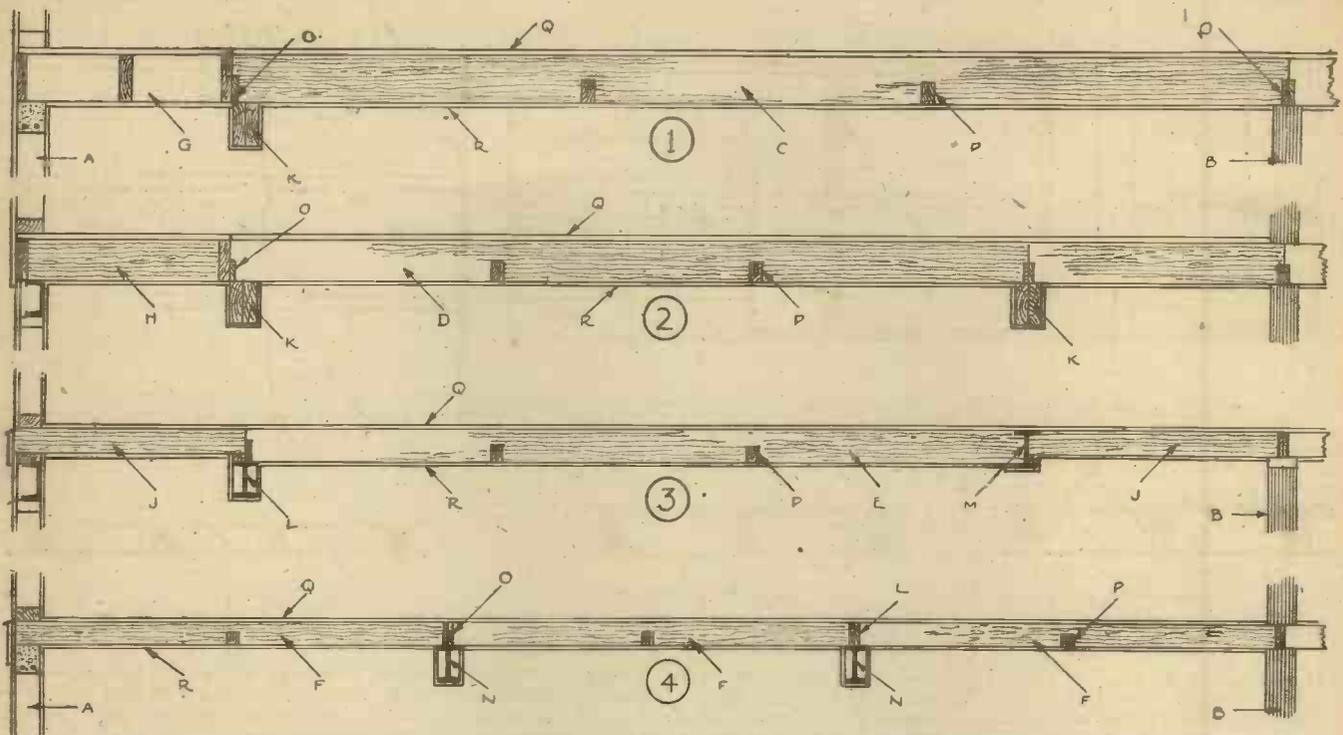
Four longitudinal sections (1), (2), (3) and (4) showing how the introduction of beams affect the length, thickness and weight of pre-built floor units of timber construction. (1) Long floor units of considerable depth. (2) and (3) Medium length floor units of moderate depth. (4) Short floor units of small depth.
